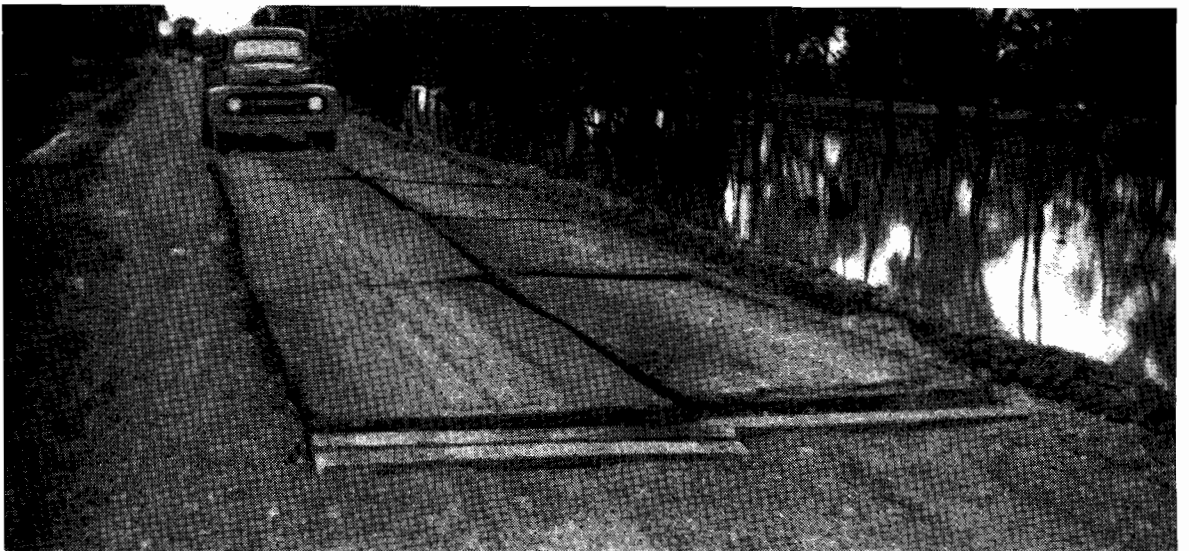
Timber mats used to reinforce a section of failed pavement at Culgoa.
